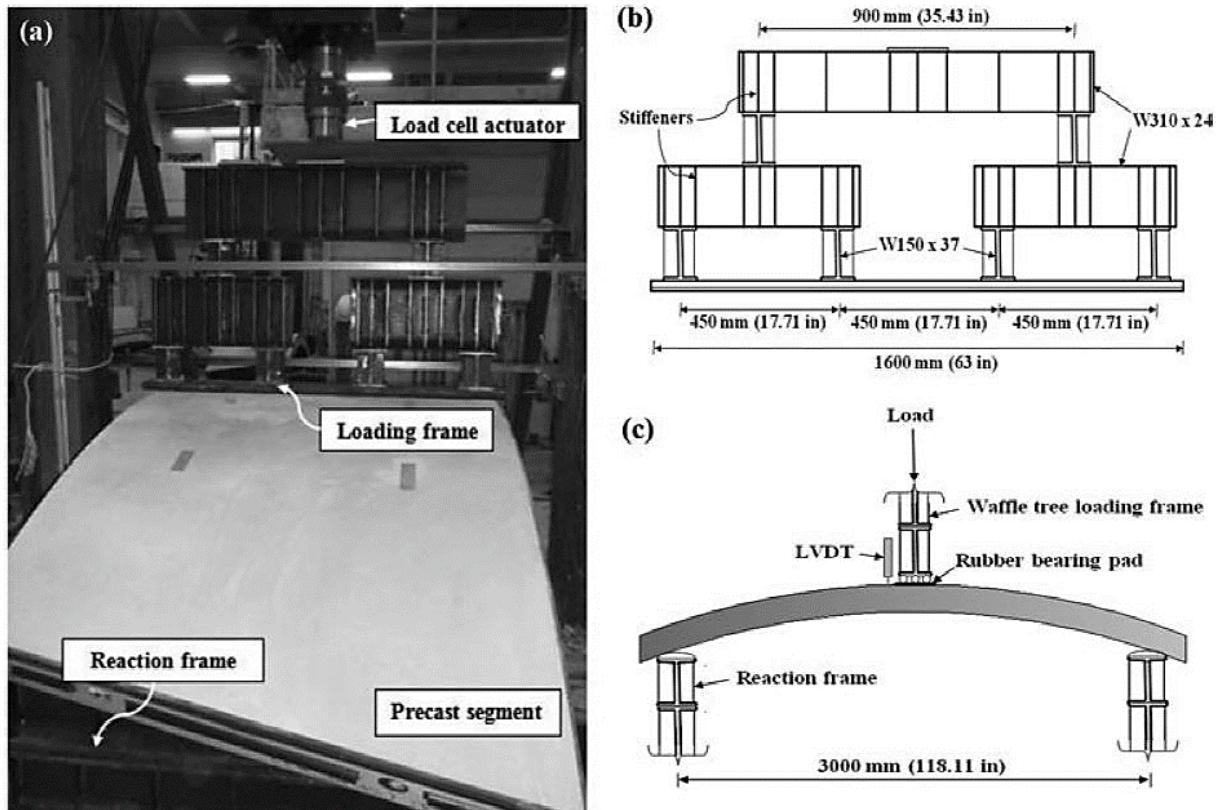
Flexural testing of PCTL segments: (a) instrumentation test setup; (b) waffle tree loading frame; and (c) schematic of flexural test Abbas et.al [13].
